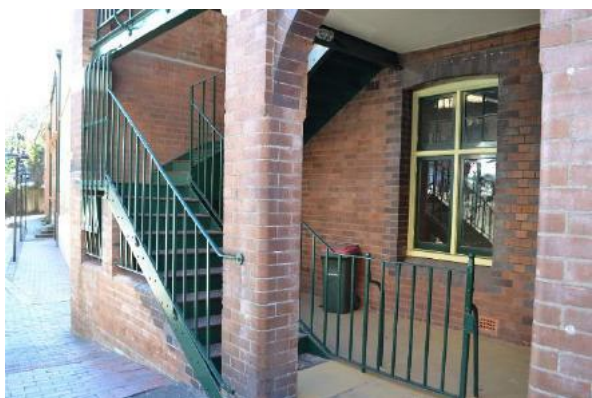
Shared access to first floor verandah and entrance to flat 46A—46–56 Gloucester Street. (Source: GML Heritage, July 2016)
